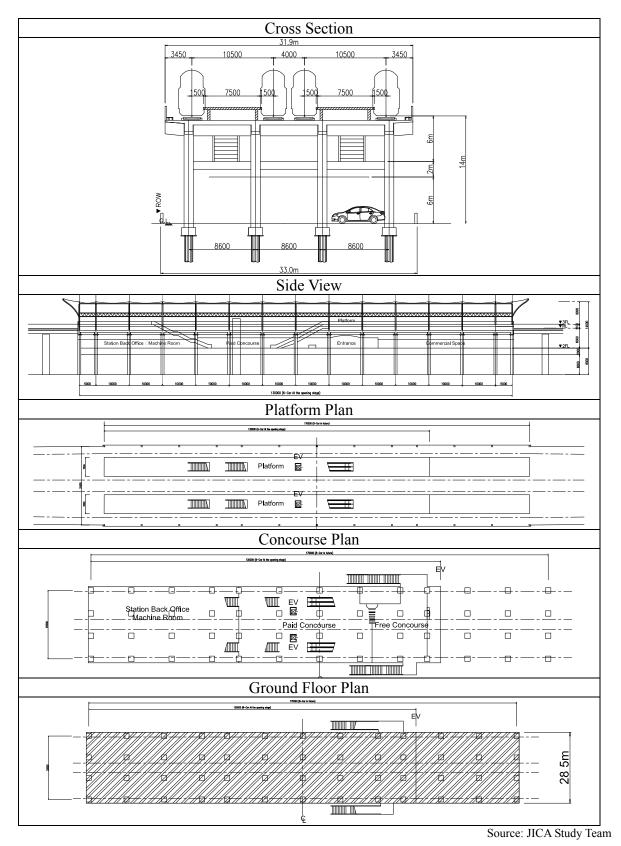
Station Plan (Elevated 2-Island, Elevated Concourse)
